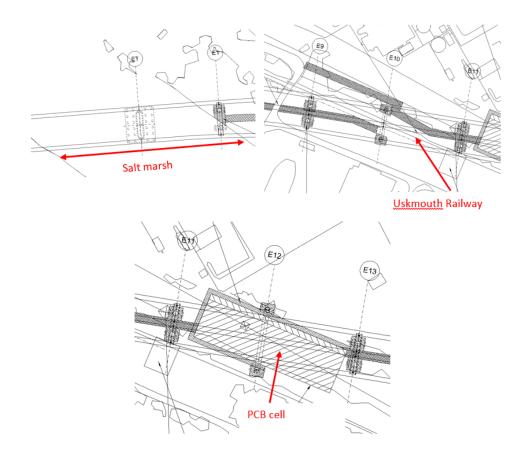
Clockwise from top left – a) Salt marsh and public footway between East tower and Pier E1, b) Uskmouth railway between piers E9 and E11 with bridge over the railway to the north west of Pier E9, c) PCB cell directly beneath the deck between piers E11 to E12
